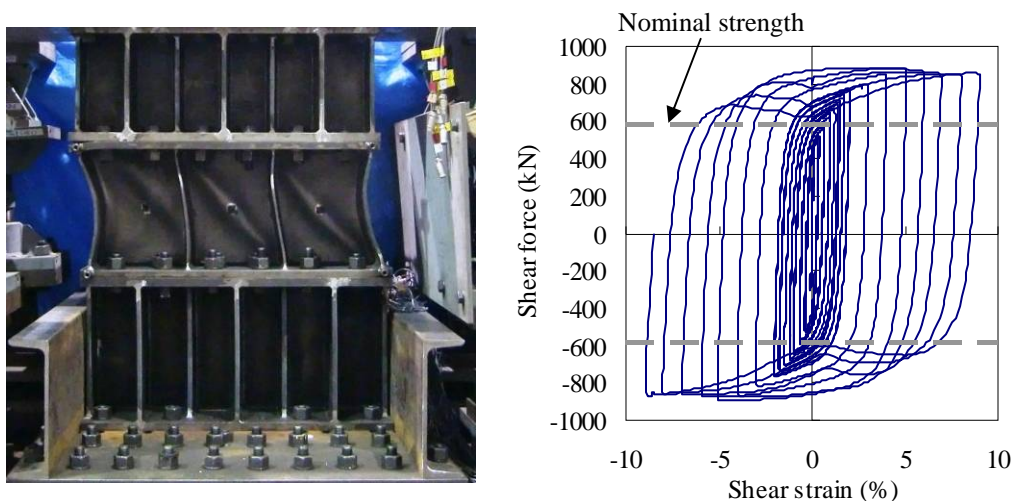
Steel damper deformations and its hysteretic response to cyclic loading [15]
